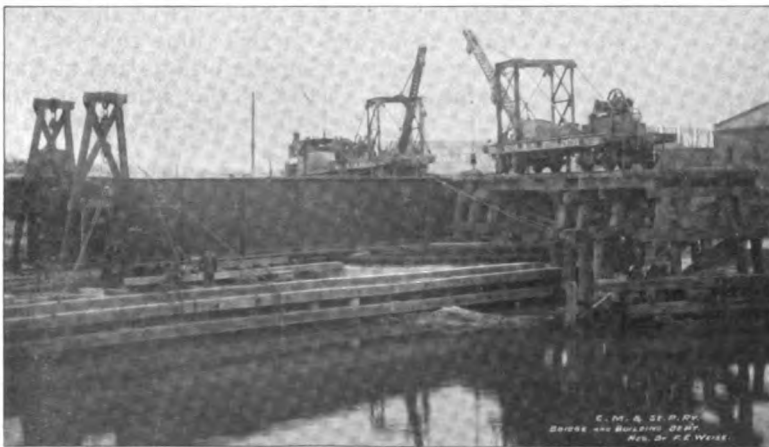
Shows Middle Section Just after having been Rolled to Place.
